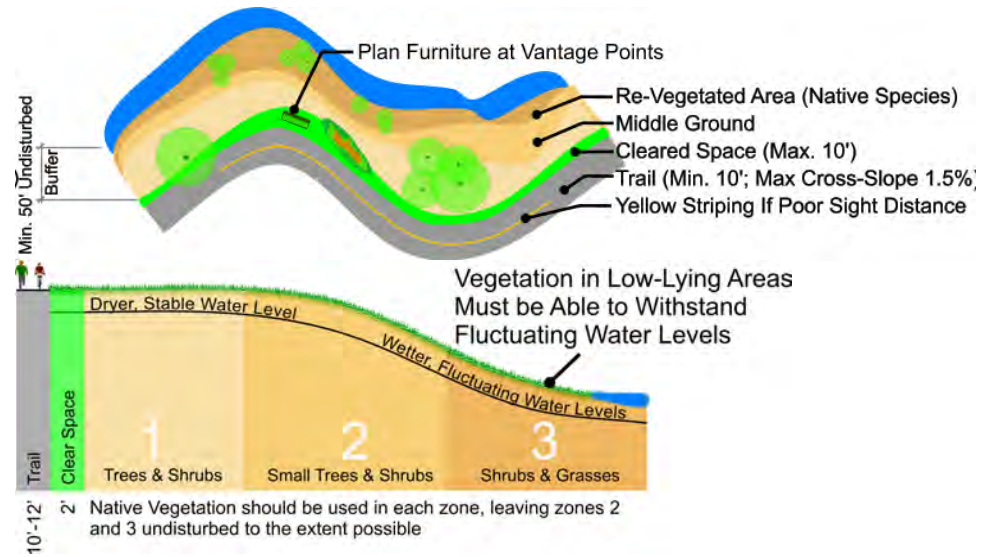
Greenway Plan View (top) and Cross-Section (bottom)
